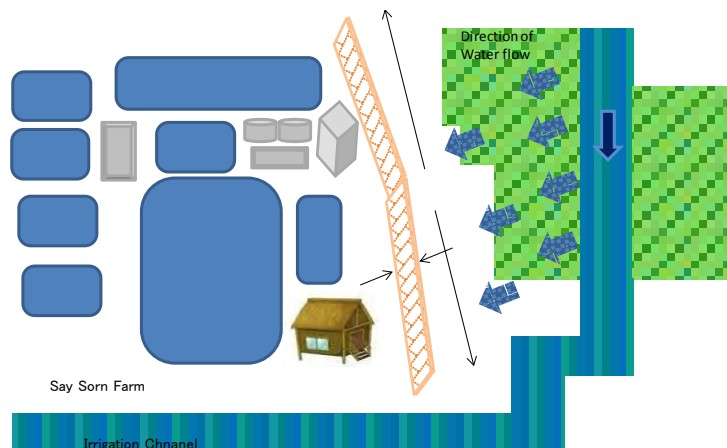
Site view to install protection wall in seed farms, Siem Reap
